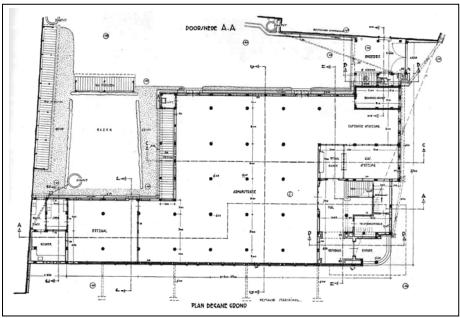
Borsumij Office, Semarang: ground floor.
